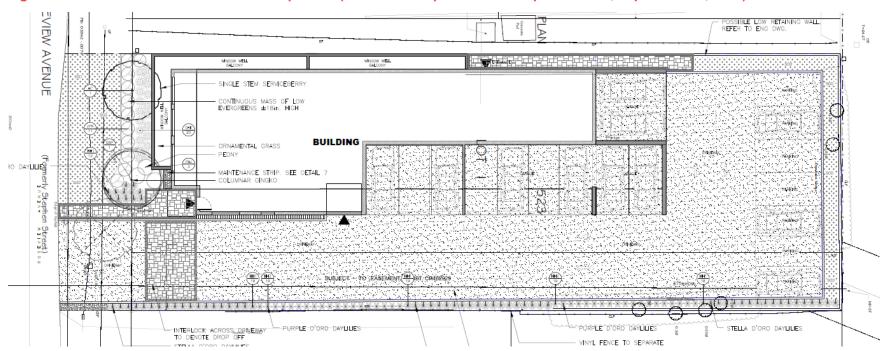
817 Roseview Avenue – Landscape Plan (John K. Szczepaniak Landscape Architect, September 24, 2021)
